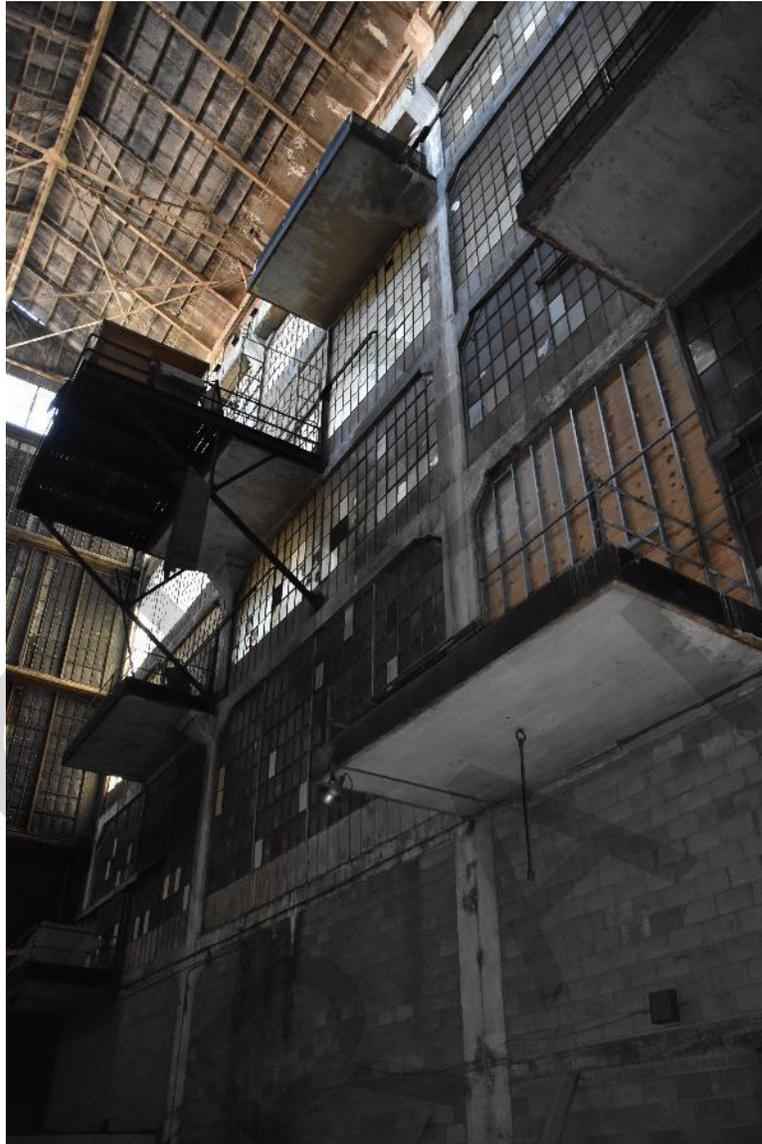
Ford Motor Company Assembly Plant, Crane Shed interior
